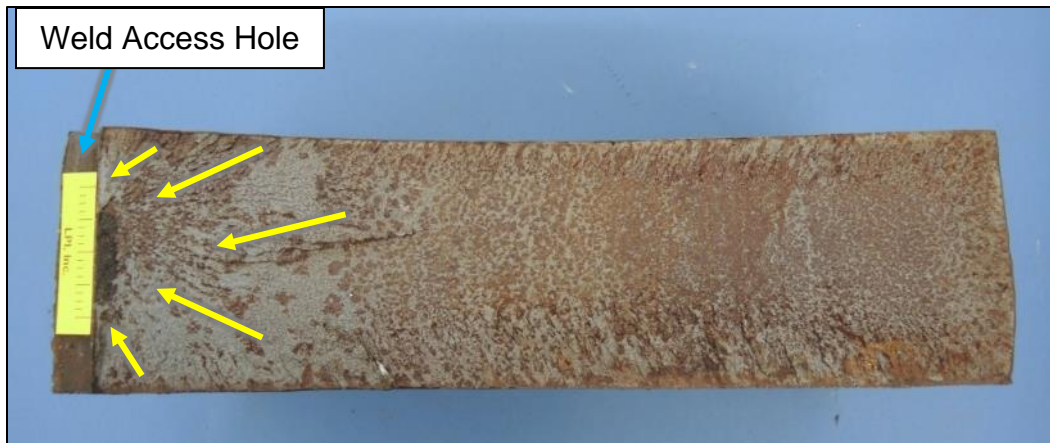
Chevron marks (yellow arrows) on the fracture surface of girder sample E.6-SW pointing towards the origin at the edge of the weld access hole.
